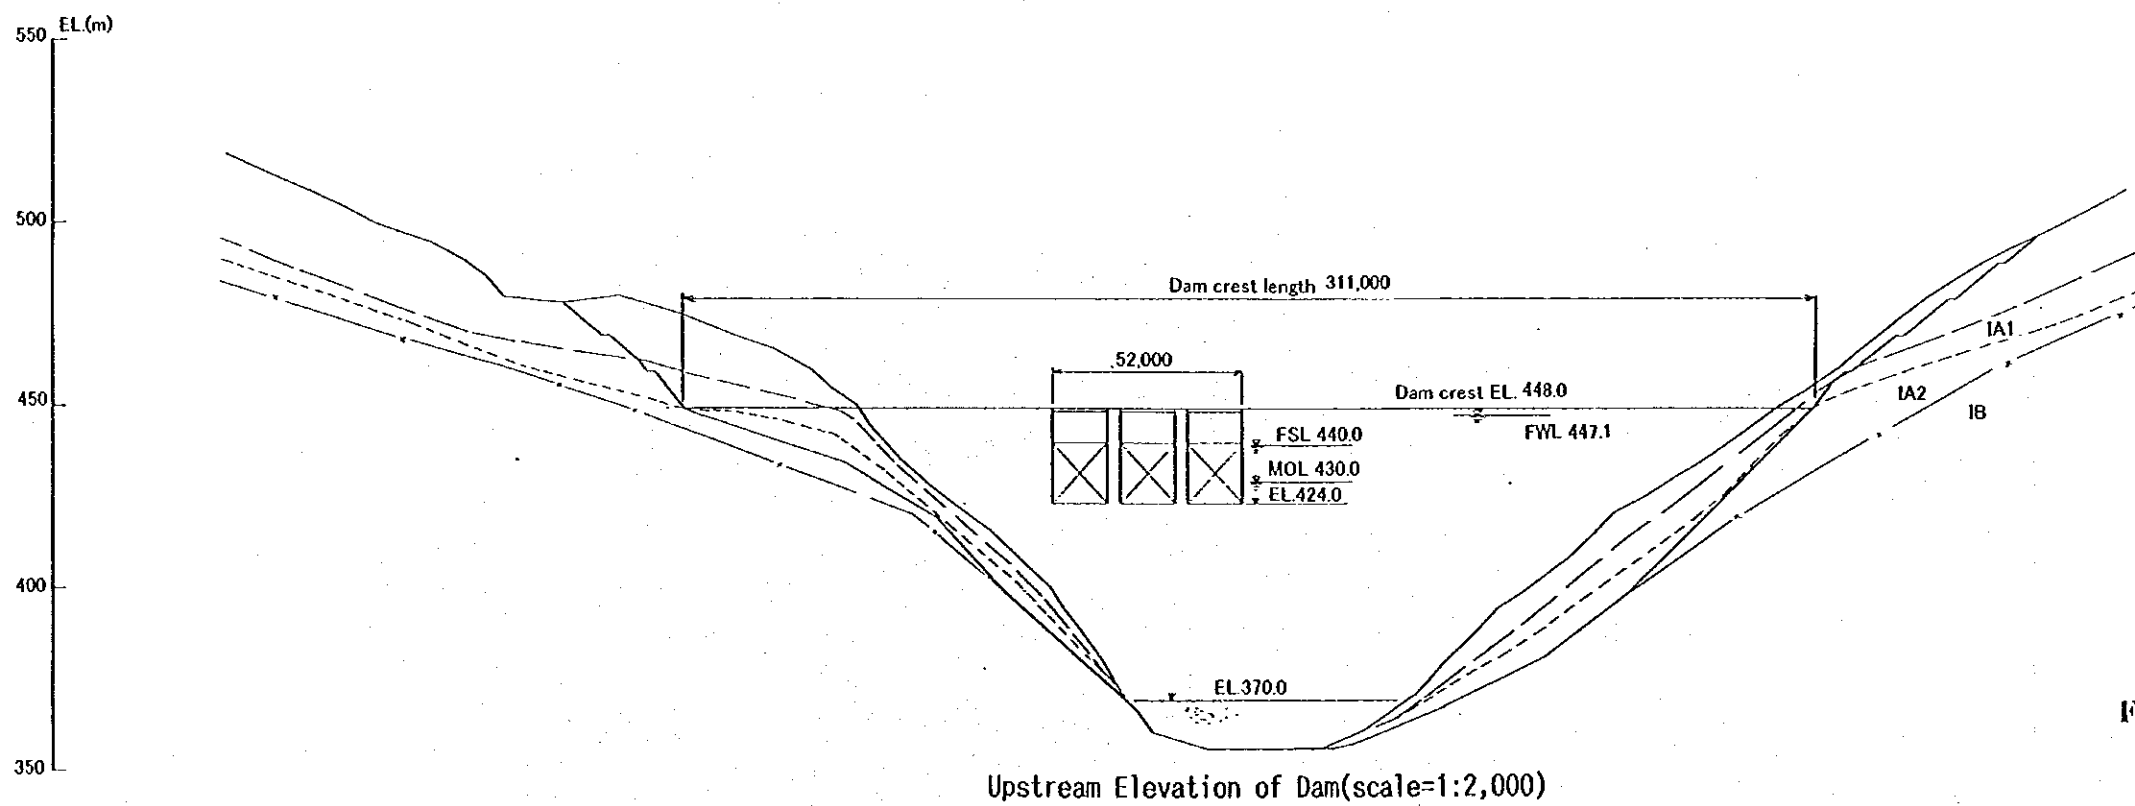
Concrete Gravity Type Dam for Dong Nai No.3 Dam
